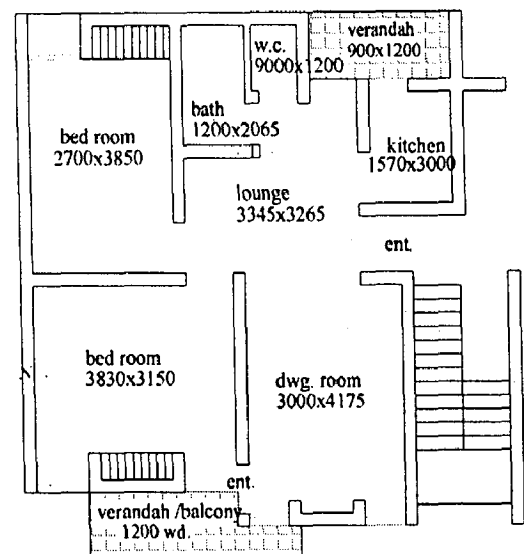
UNIT PLAN (VASUNDHARA)
